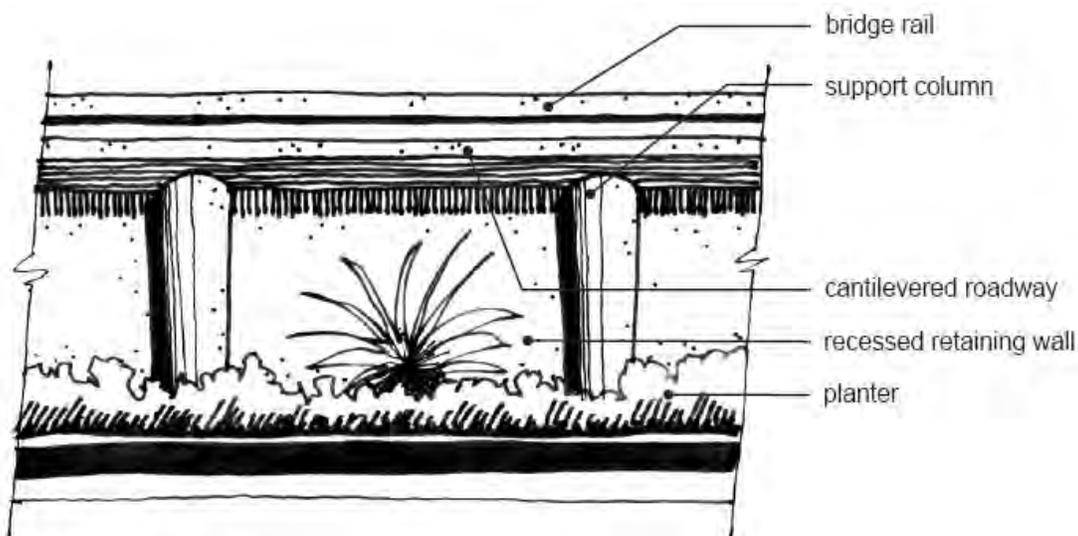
Viaduct retaining wall (Elevation View)
